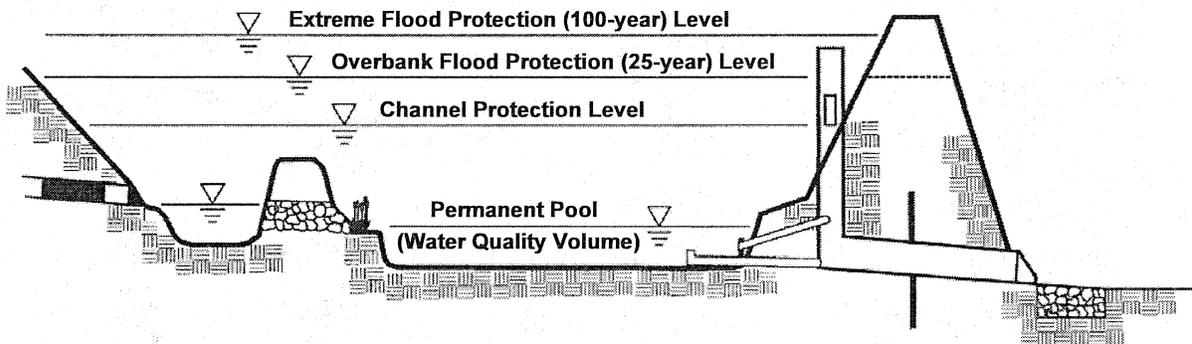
Unified Sizing Criteria Water Surface Elevations in a Stormwater (Wet) Pond
